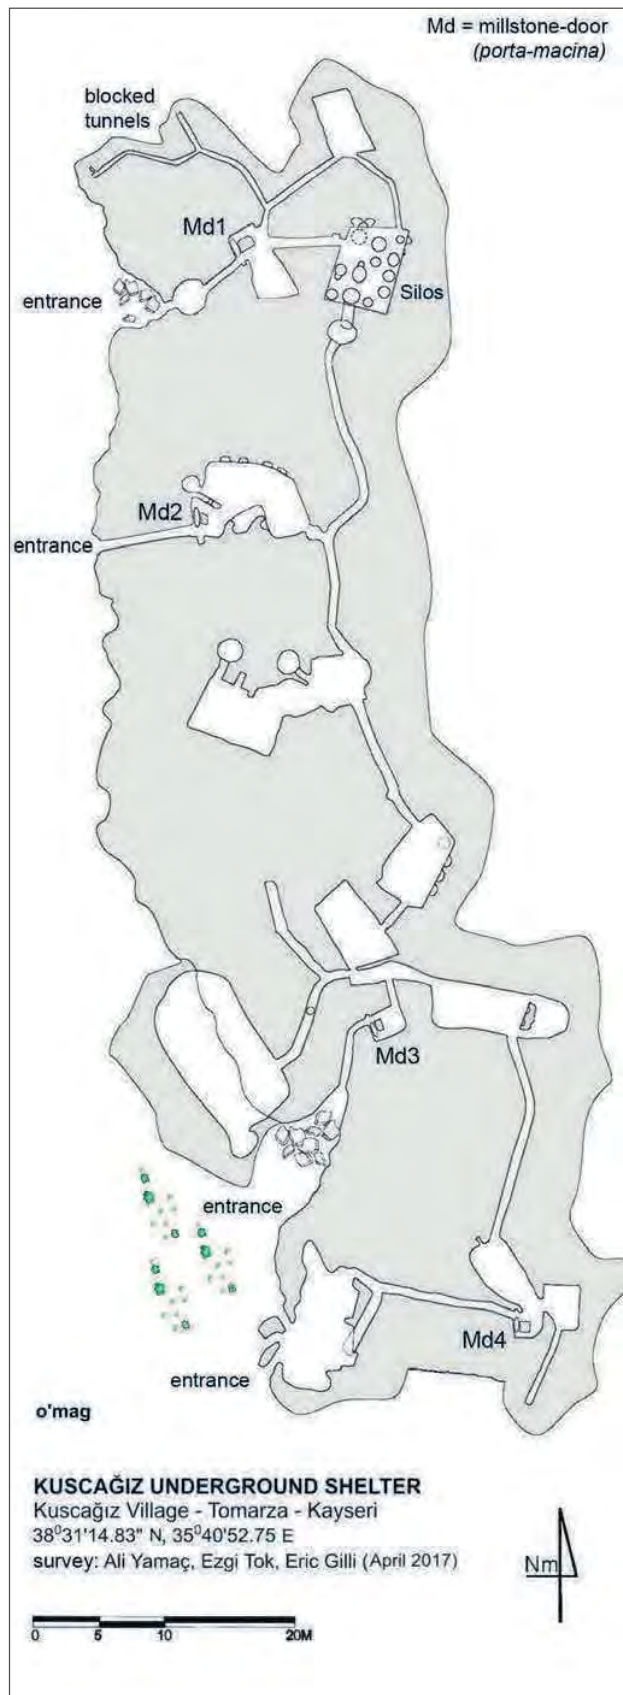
Plan of Kuşcağız Underground Shelter (drawing A. Yamaç, E. Tok, E. Gilli).
